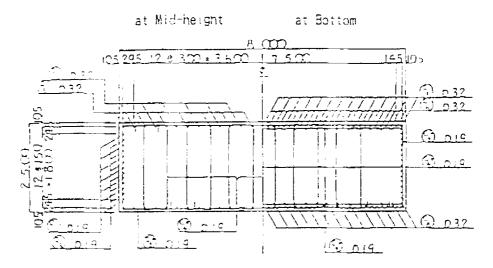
Cross Section and Reinforcement of Pier (P1)
